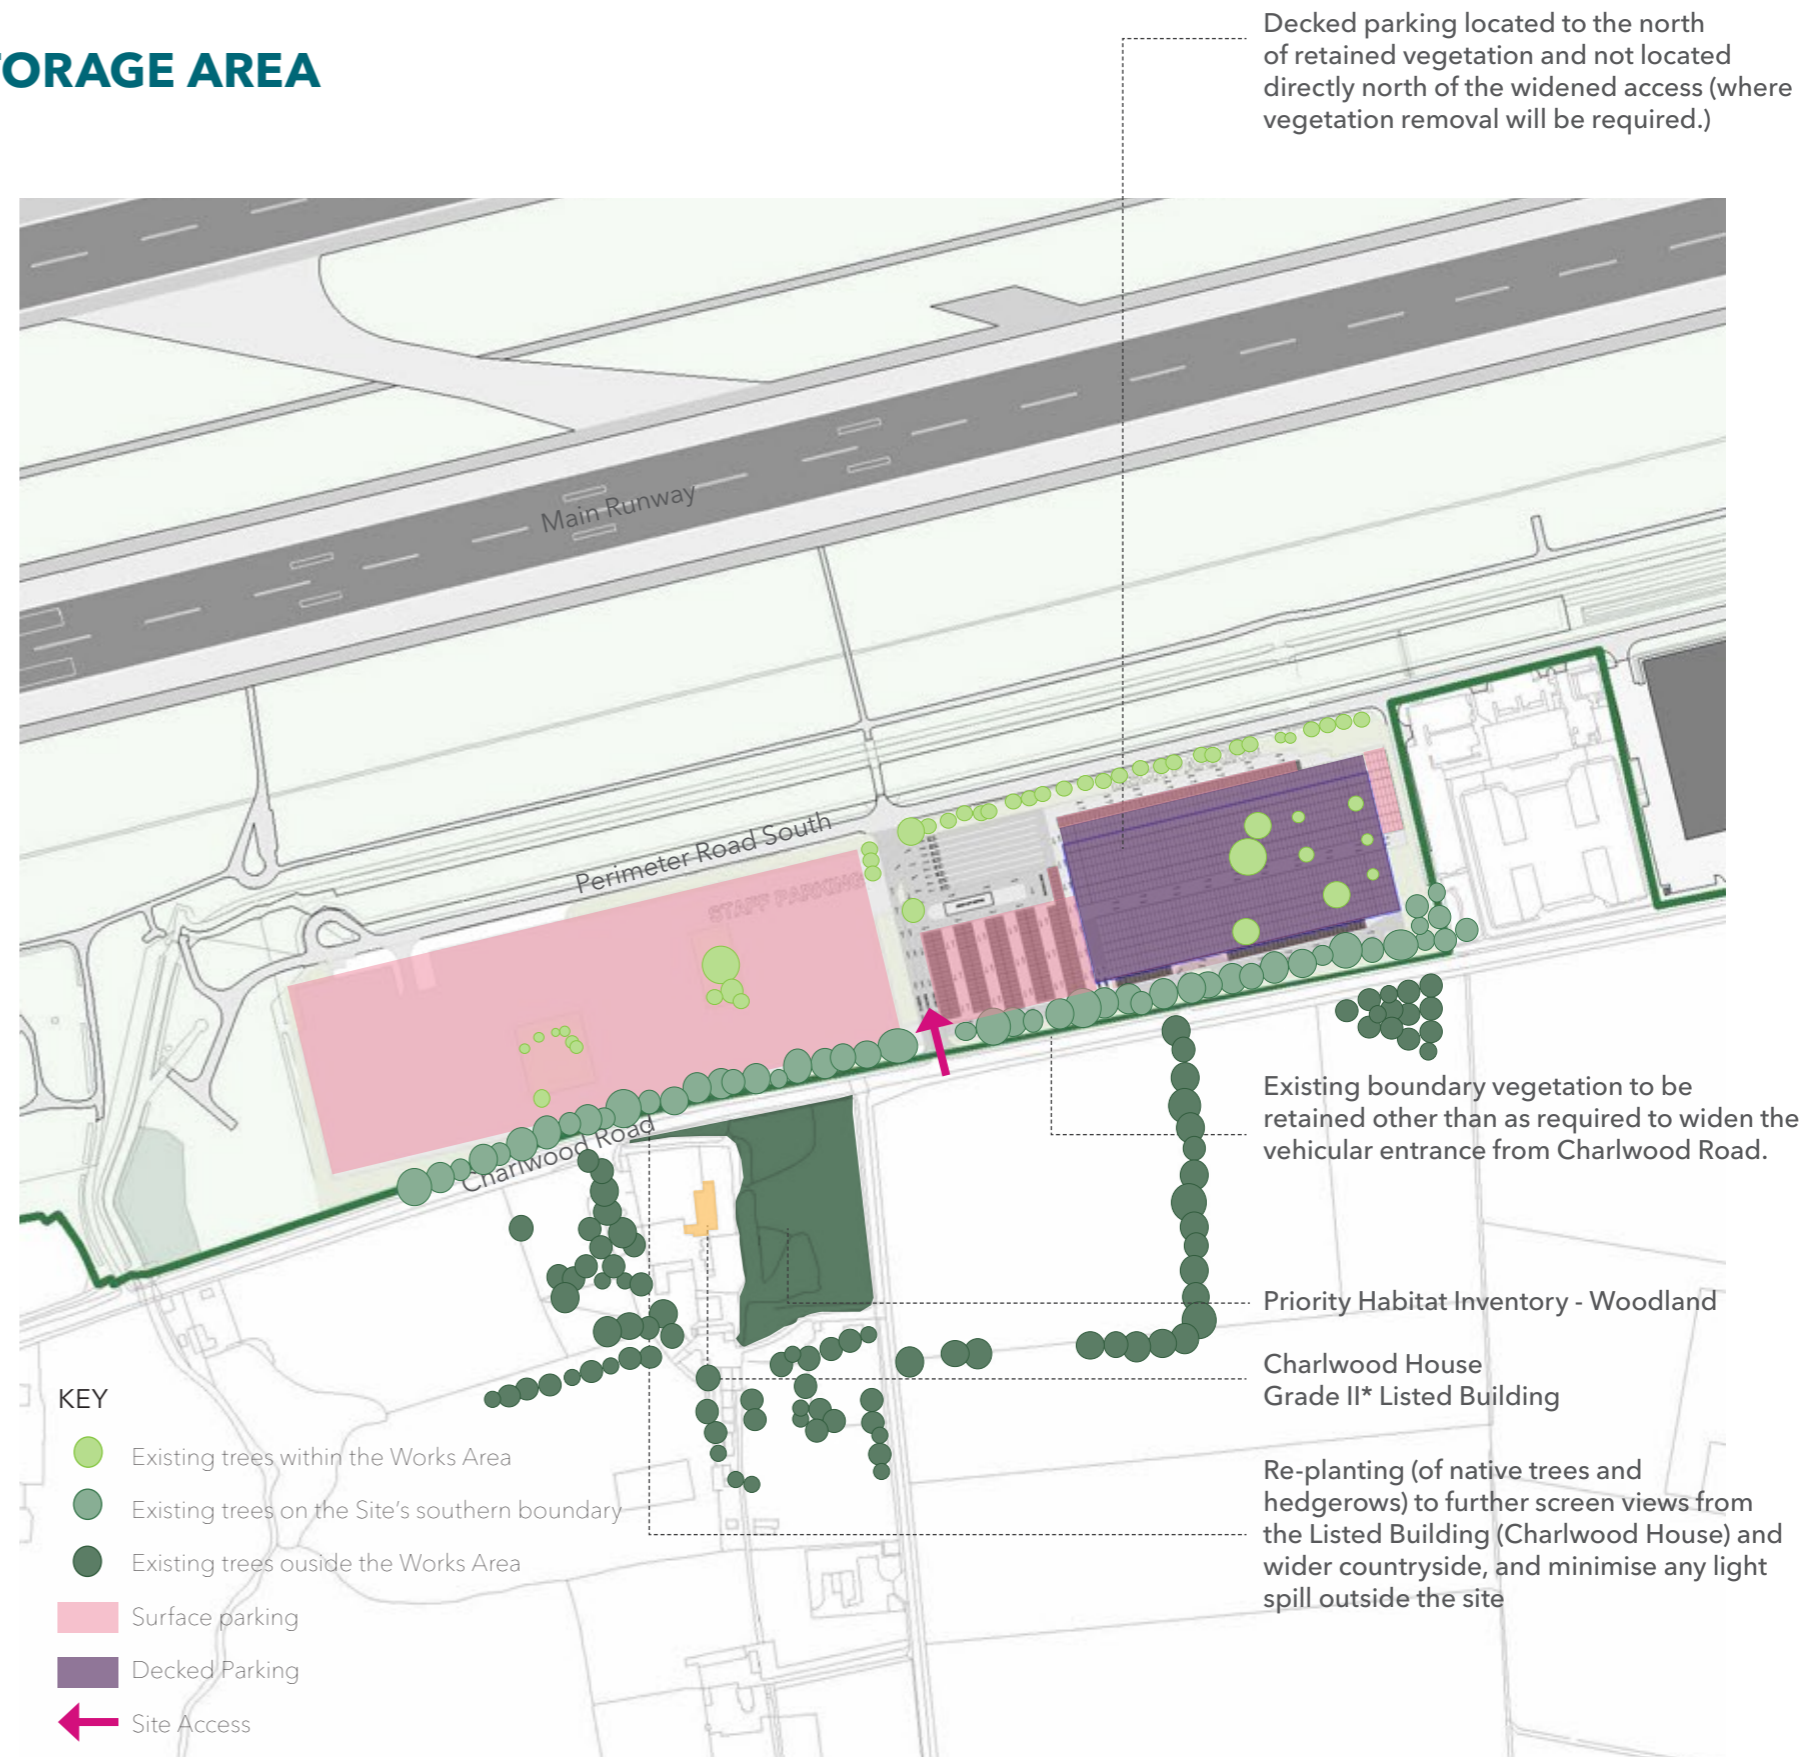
Car Park X Deck Parking and Flood Storage Area Overall Site Location
